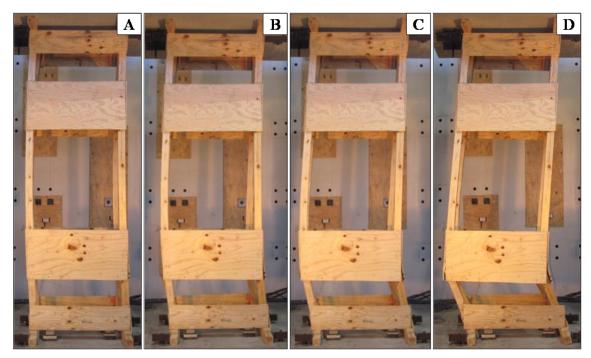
Specimen 5 Failure Progression A) Bowing of Posts B) Back Posts Fail C) Front Posts Fail D) Final Condition at End of Test
